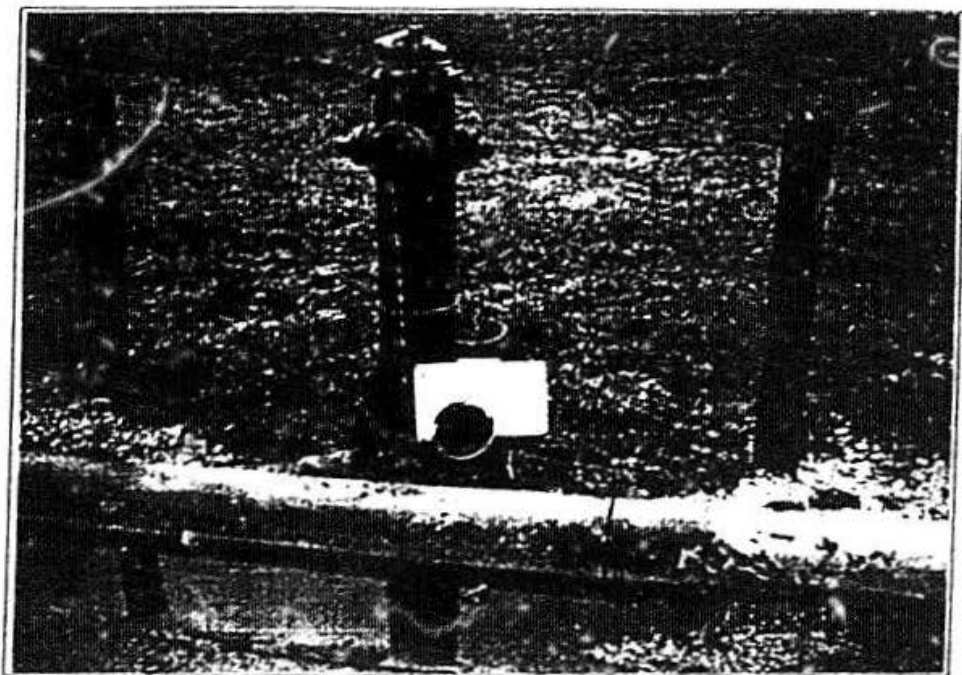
Fire hydrant leak. Note ground cover and condition of hydrant.
